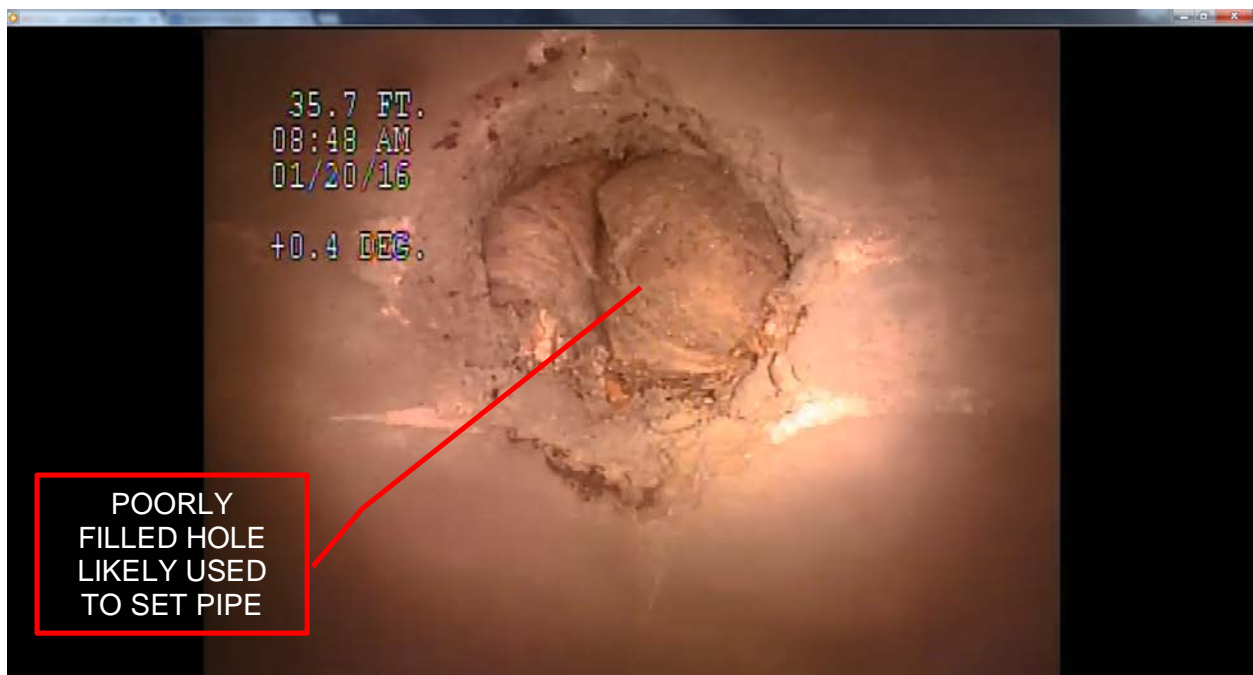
Pipe CI5-CI6: Lifting eye holes plugged with fabric but not properly grouted.
